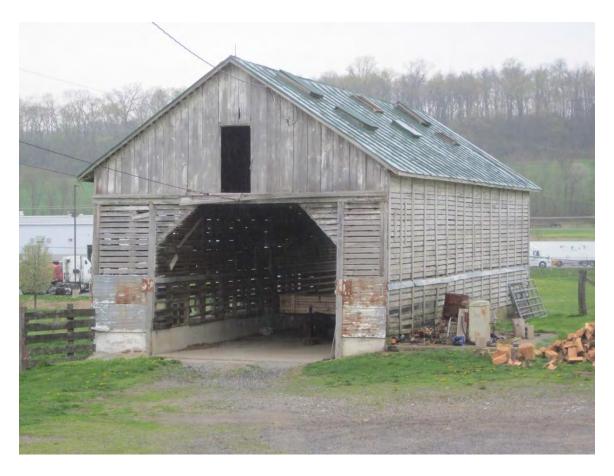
Machine Shed/Corn Crib, Southeast and Northeast Elevations.
